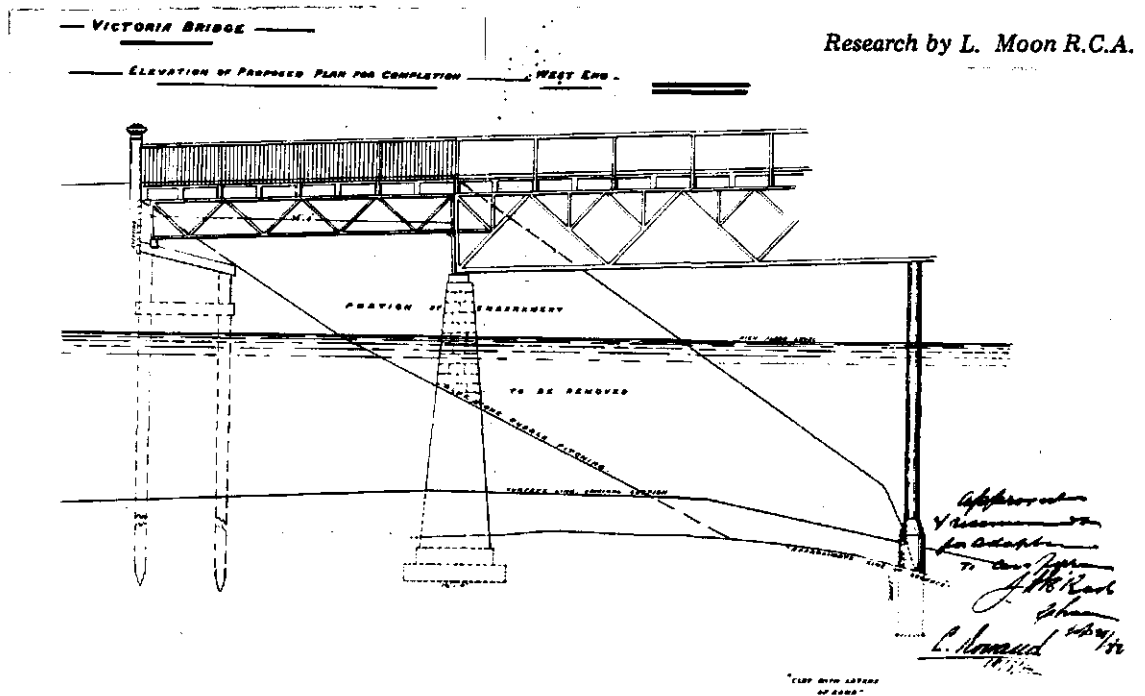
Original working drawing of Victoria Street bridge, 1880
